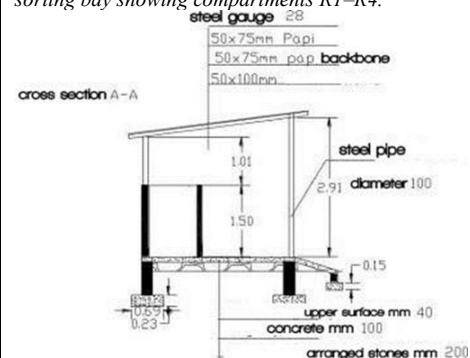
Cross-section A–A of a standard inorganic waste sorting bay showing structural design and construction details.
